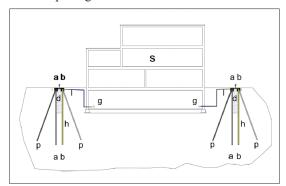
Section of two damping and geothermal barriers on the two sides of a building.
